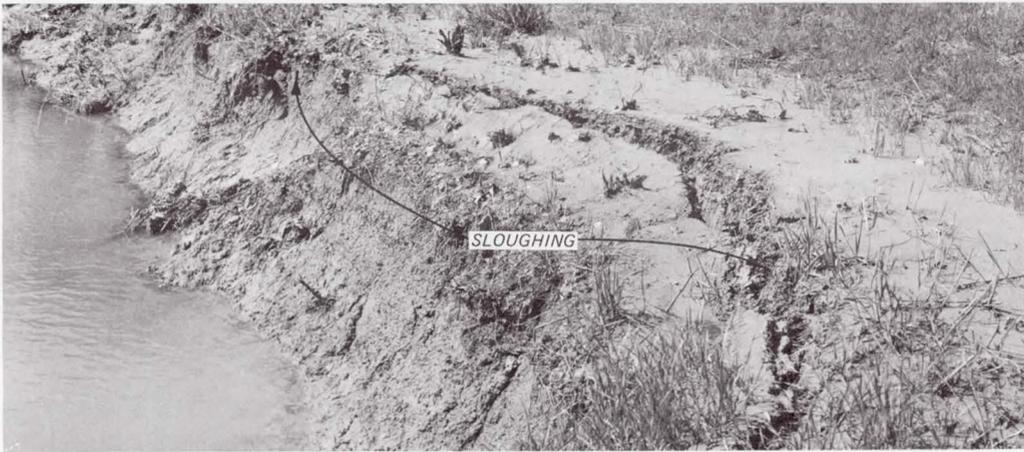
Closeup view (looking downstream) of maximum attack (note sloughing of bank)
